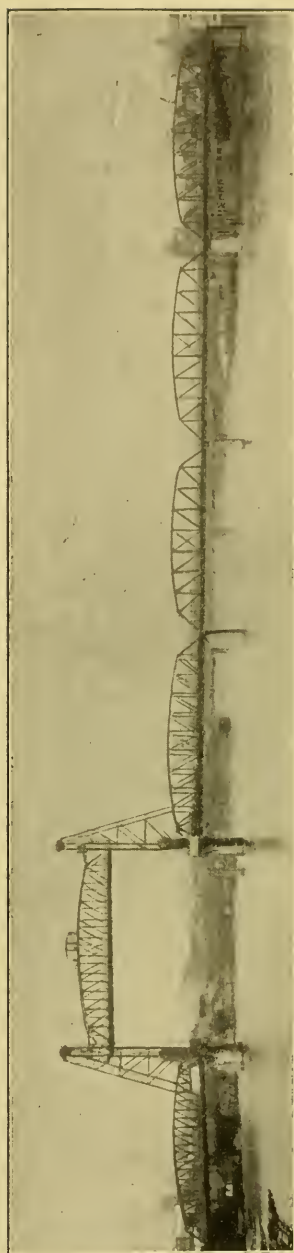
Hawthorne Avenue Bridge over the Willamette River at Portland, Ore.—Lifting Span Up.
